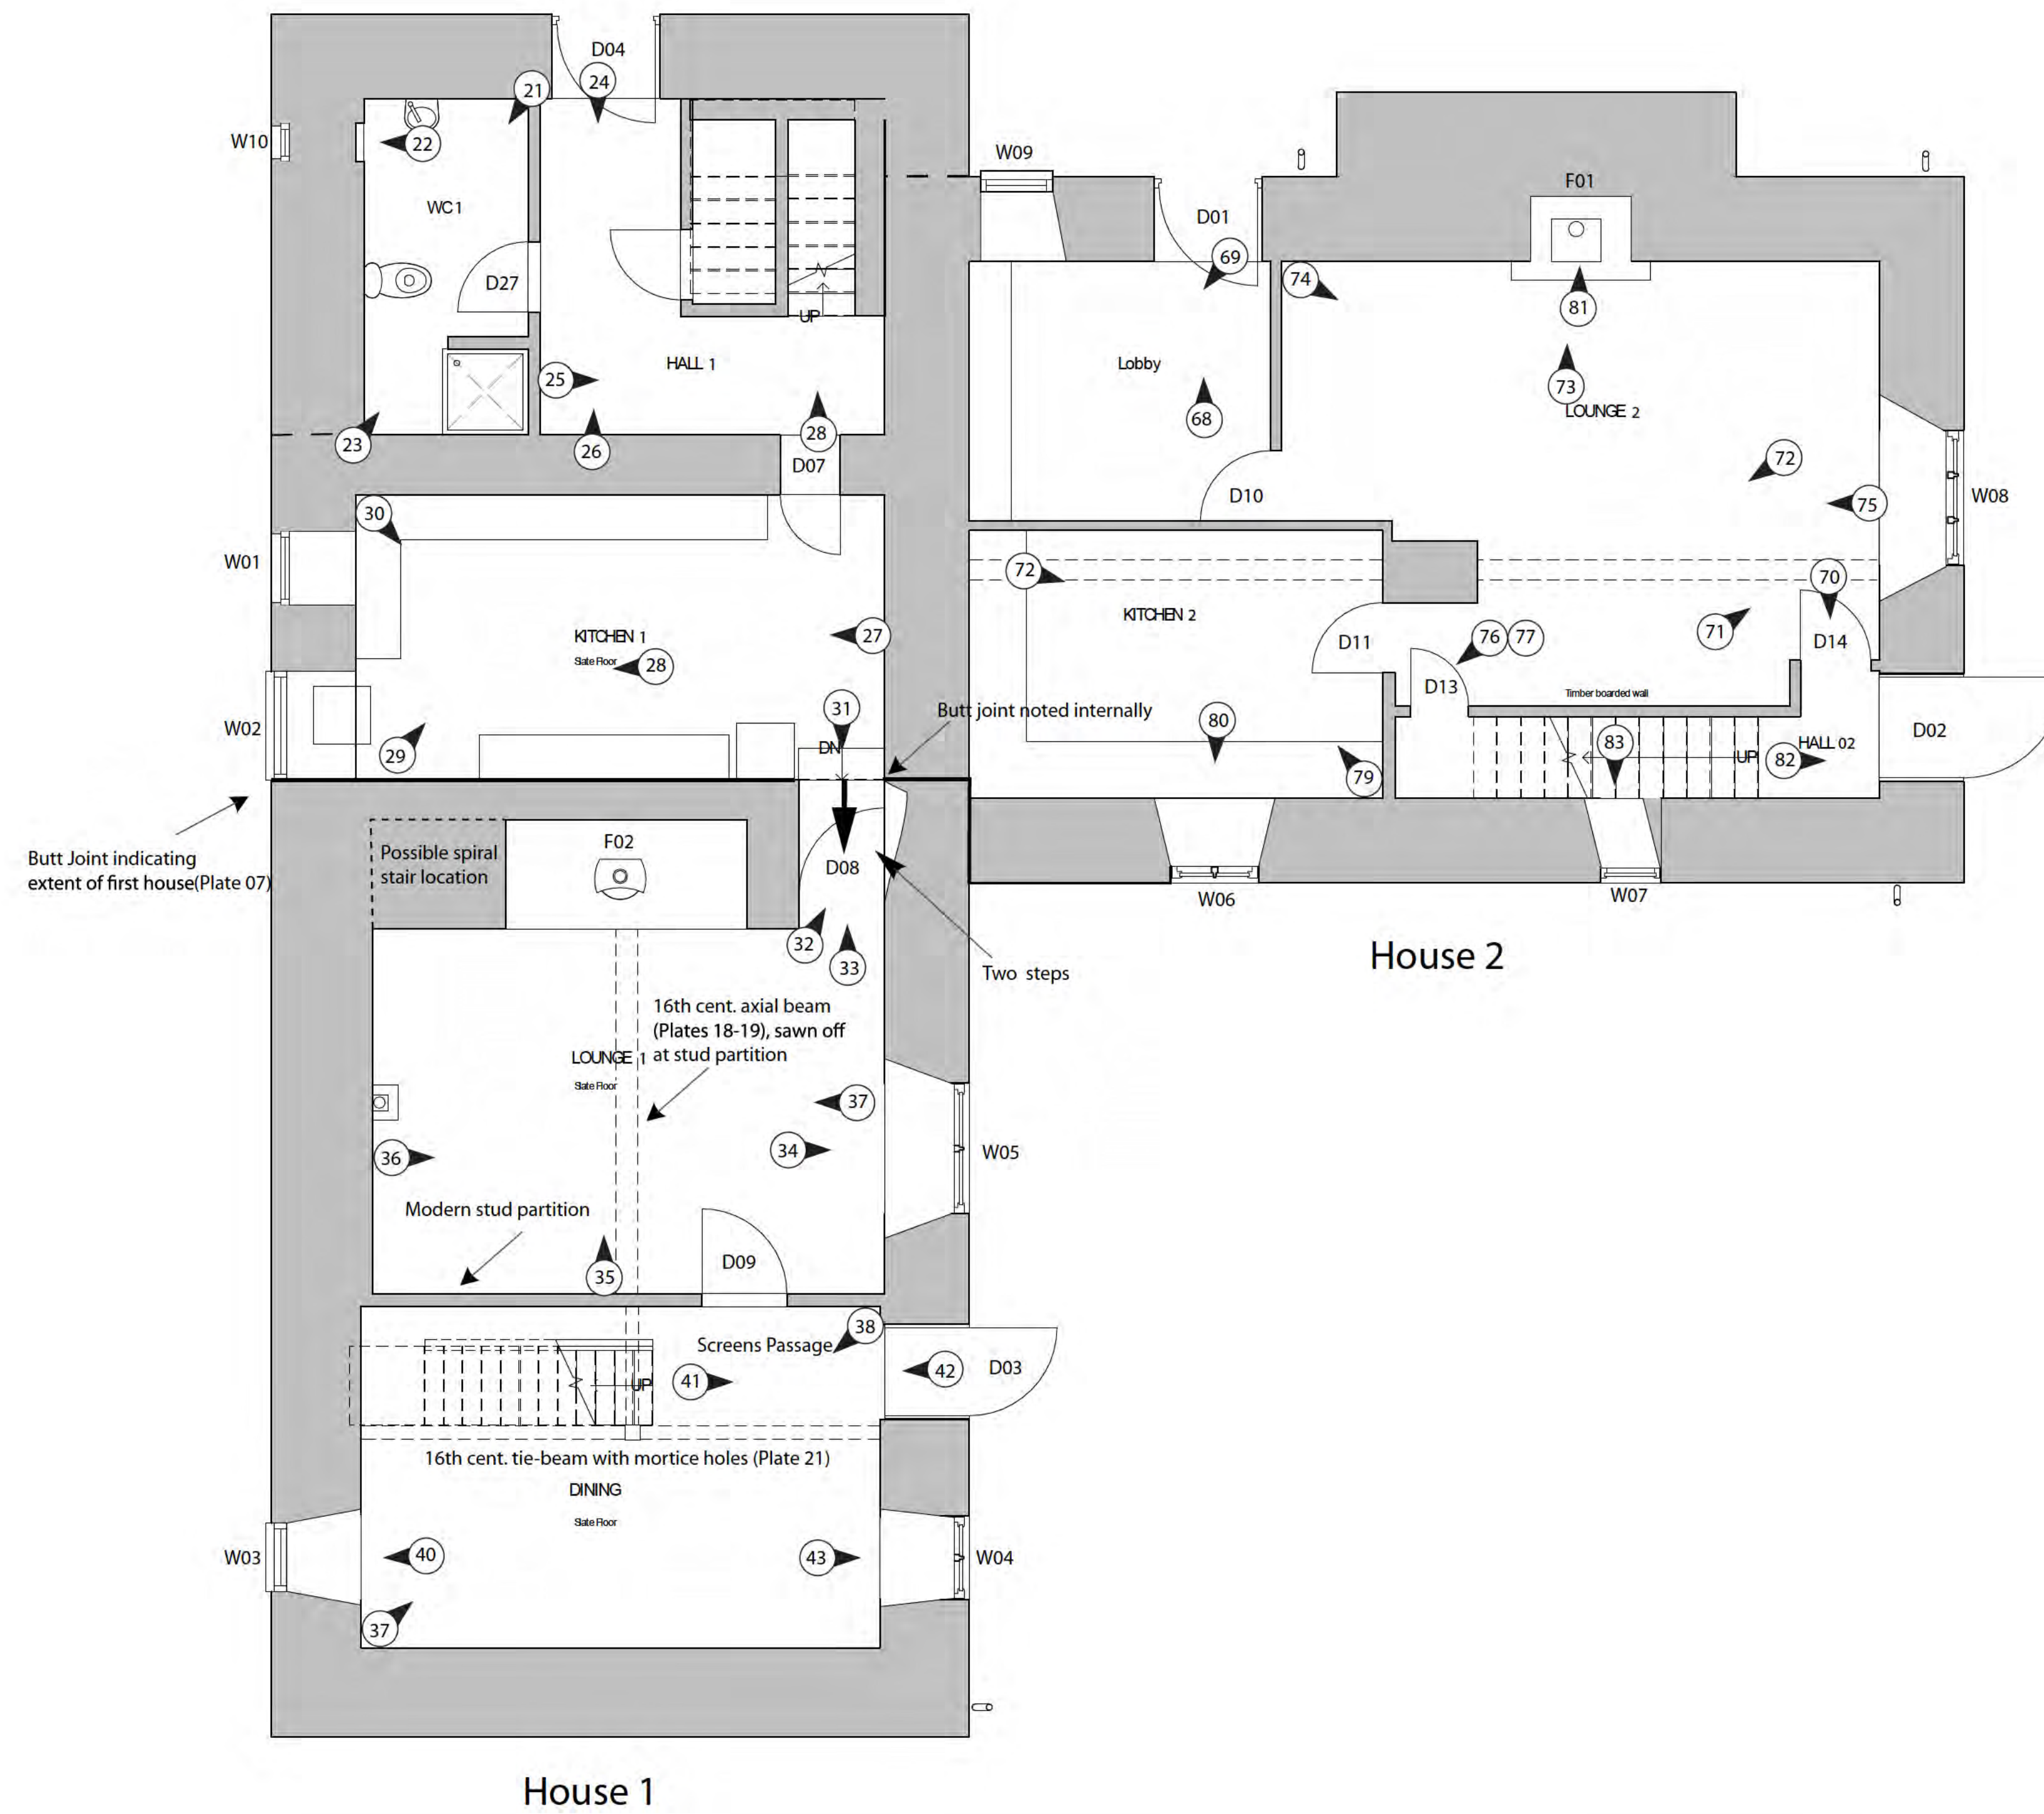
Bryn Moel Interior Plan (Ground Floor) and location of photographic archive. Based on Greenspace Architects Ltd Drawing No. 16-03 A001. Scale 1:100@A3
